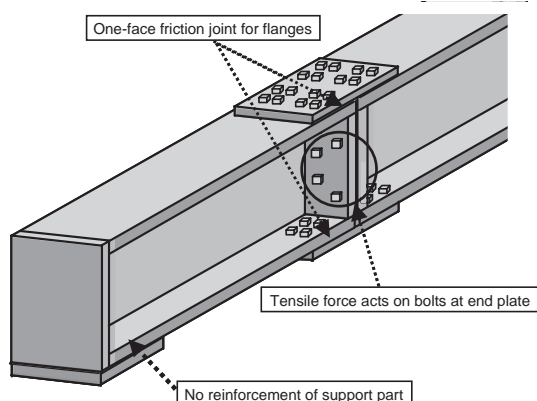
Temporary Girder Using Retaining Wall Brace (joint and support parts)
